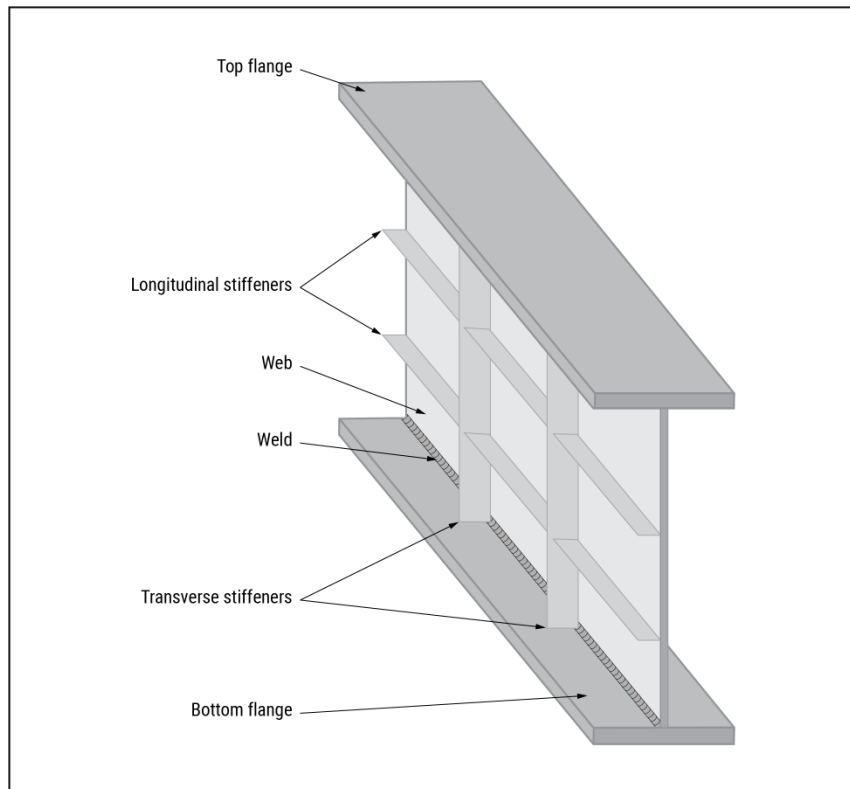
Diagram of generic built-up I-shape showing longitudinal and transverse stiffeners.
